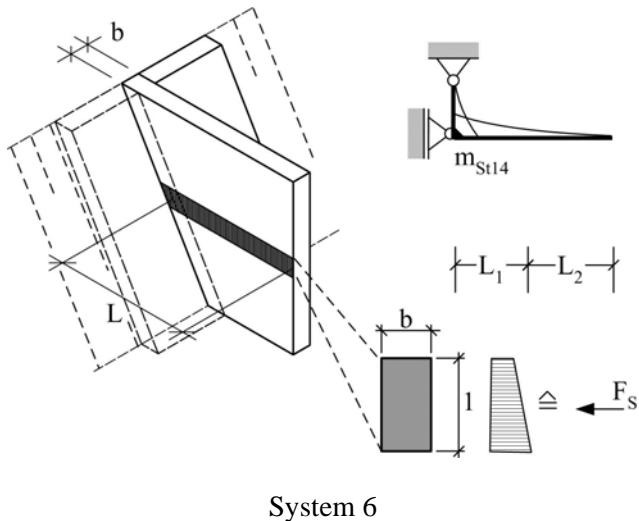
Slit barrier - Structural measures to achieve restrained supported conditions
